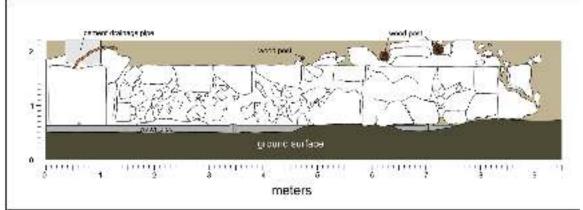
Plan view of northern end of dam with wood posts noted on western face.
